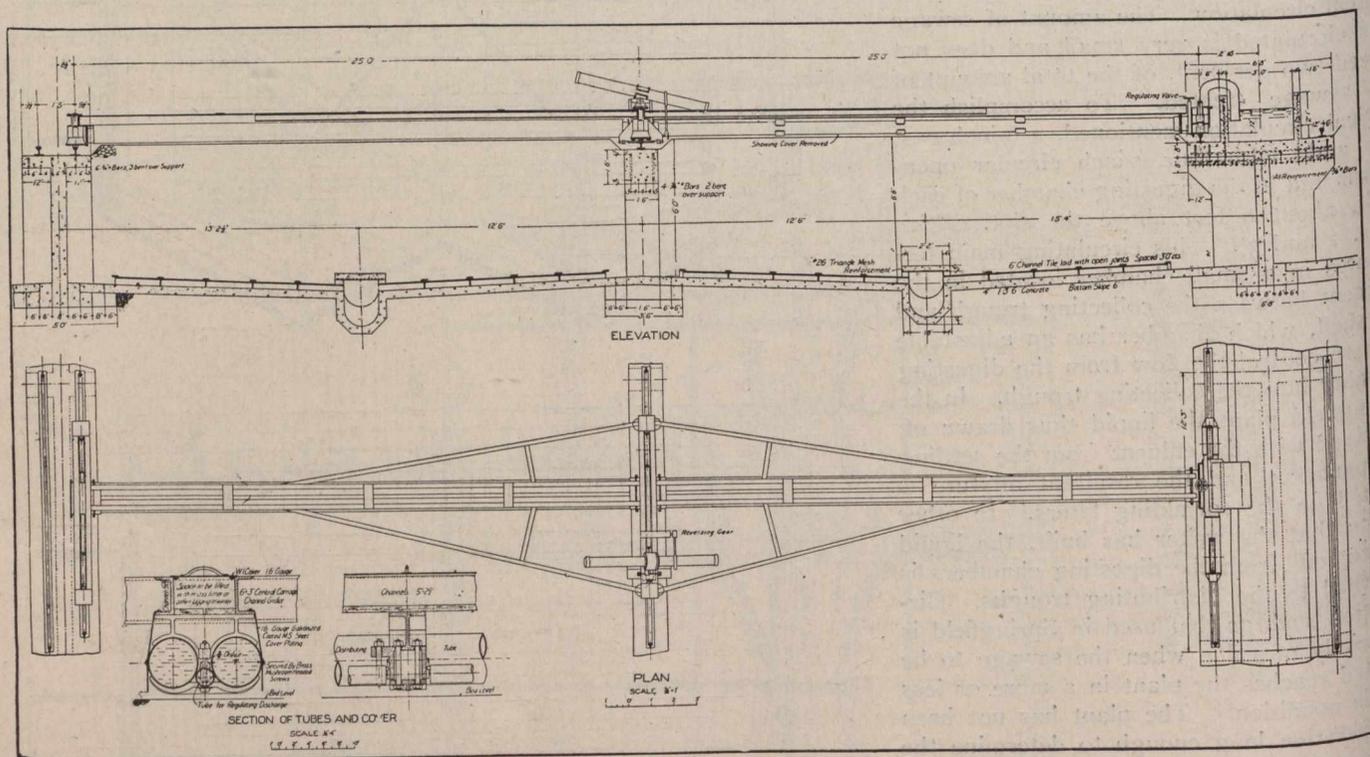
Section of Filter Unit Showing Traveling Distributor.
